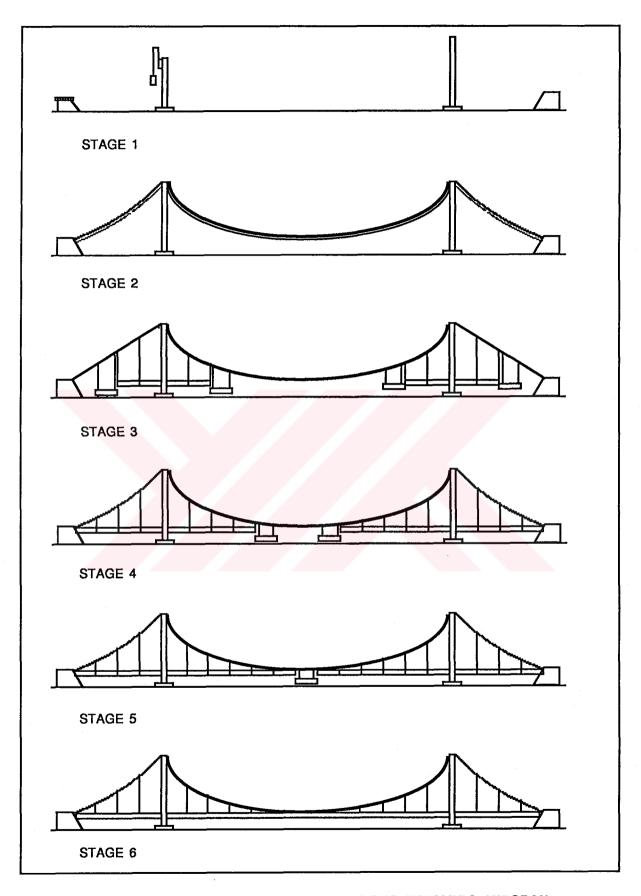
ERECTION FROM THE PYLONS TOWARDS MIDSPAN
